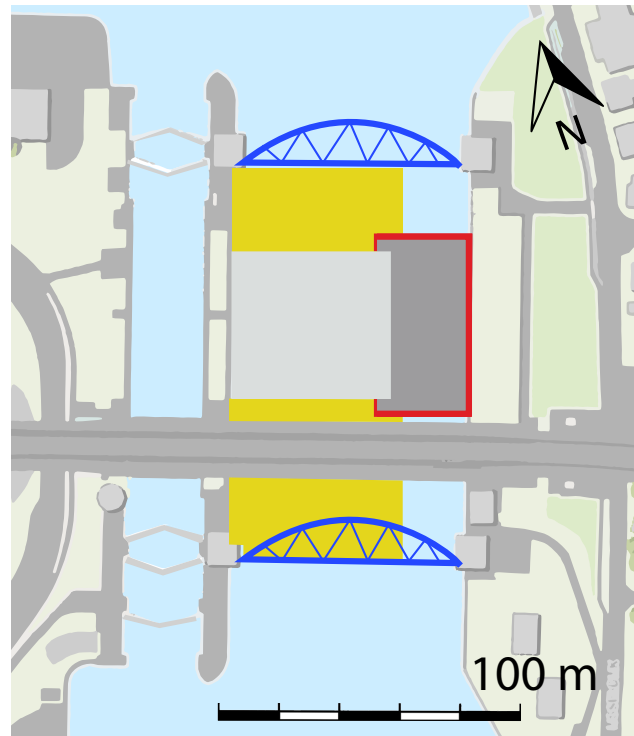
Step 3.1 & 4.1: Pour underwater concrete (dark grey) and dewater building pit.
